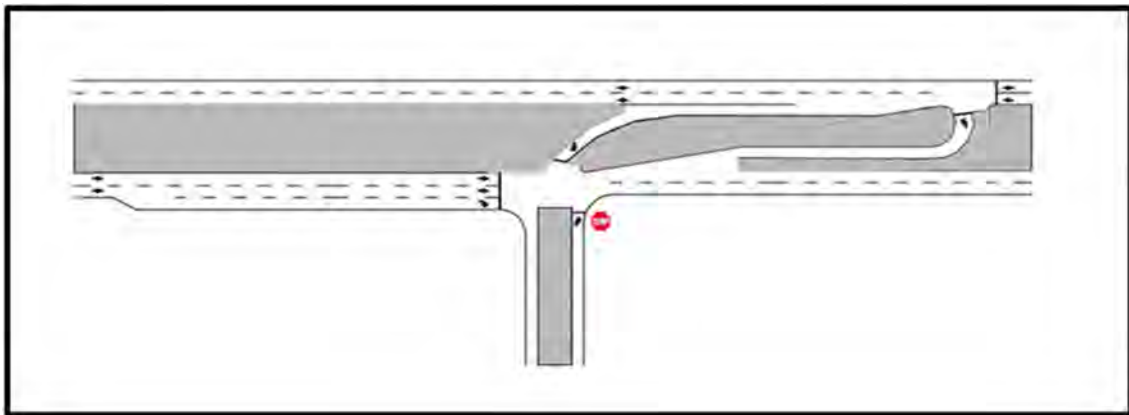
HOLLY STREET APPROACH LOOKING RIGHT
